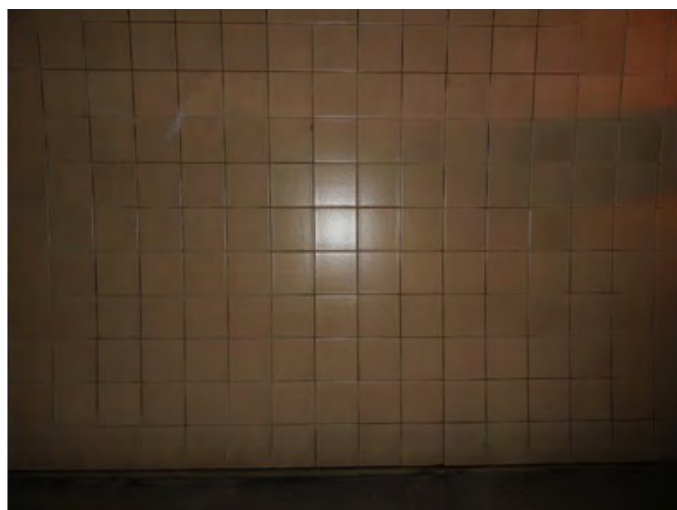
Image of tile surface evaluated at Hanging Lake Tunnel.
